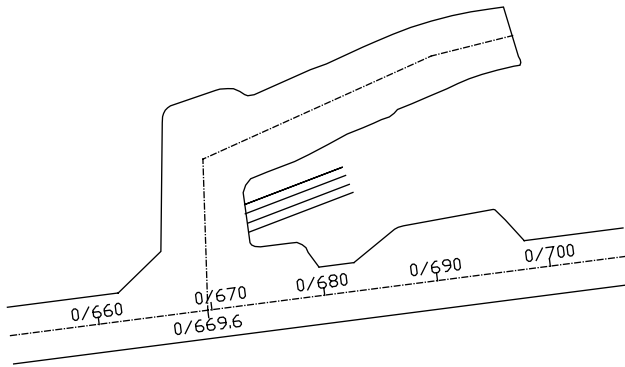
Sketch showing the access tunnel at the Äspö HRL and the grouted rock pillar.
